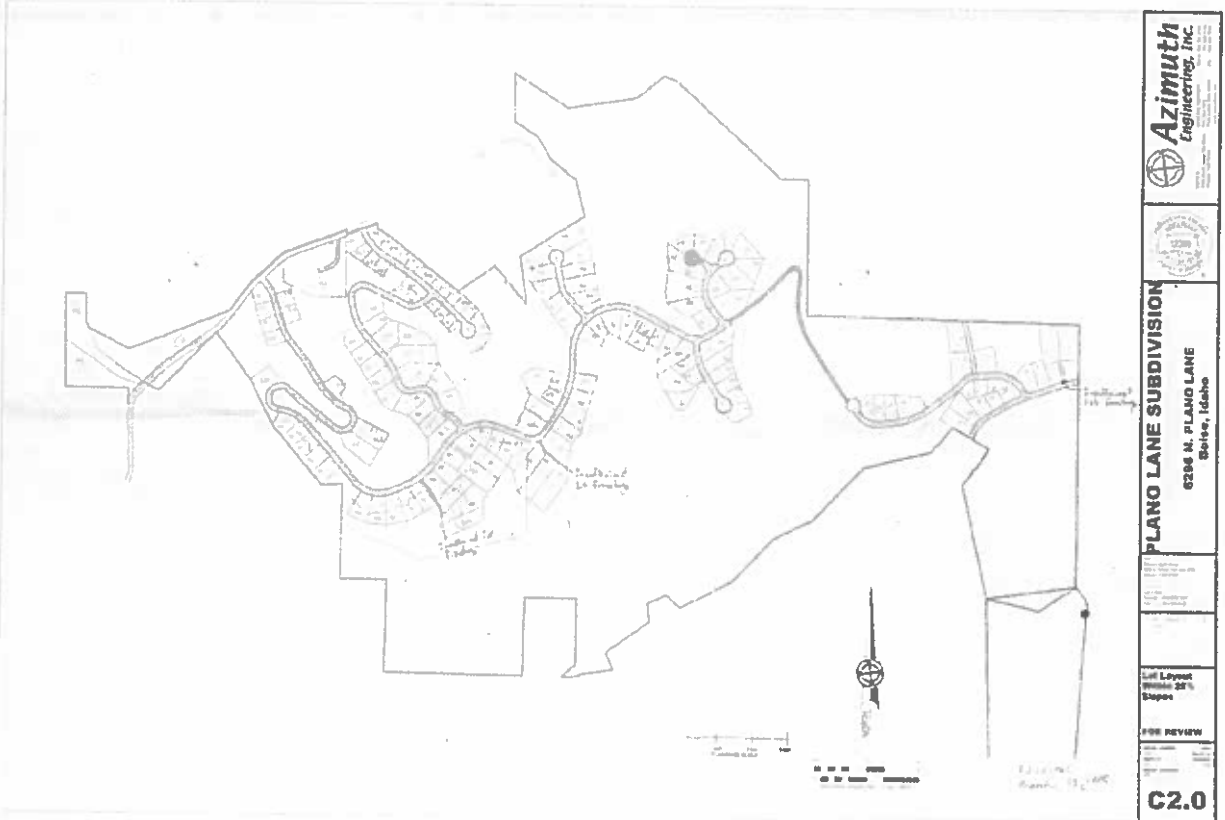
Plano Road Proposal - Building Envelope Placement Within Buildable Area
